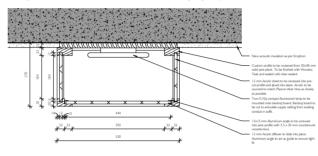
Section A-A of fire escape signage (by Author, not to scale)
